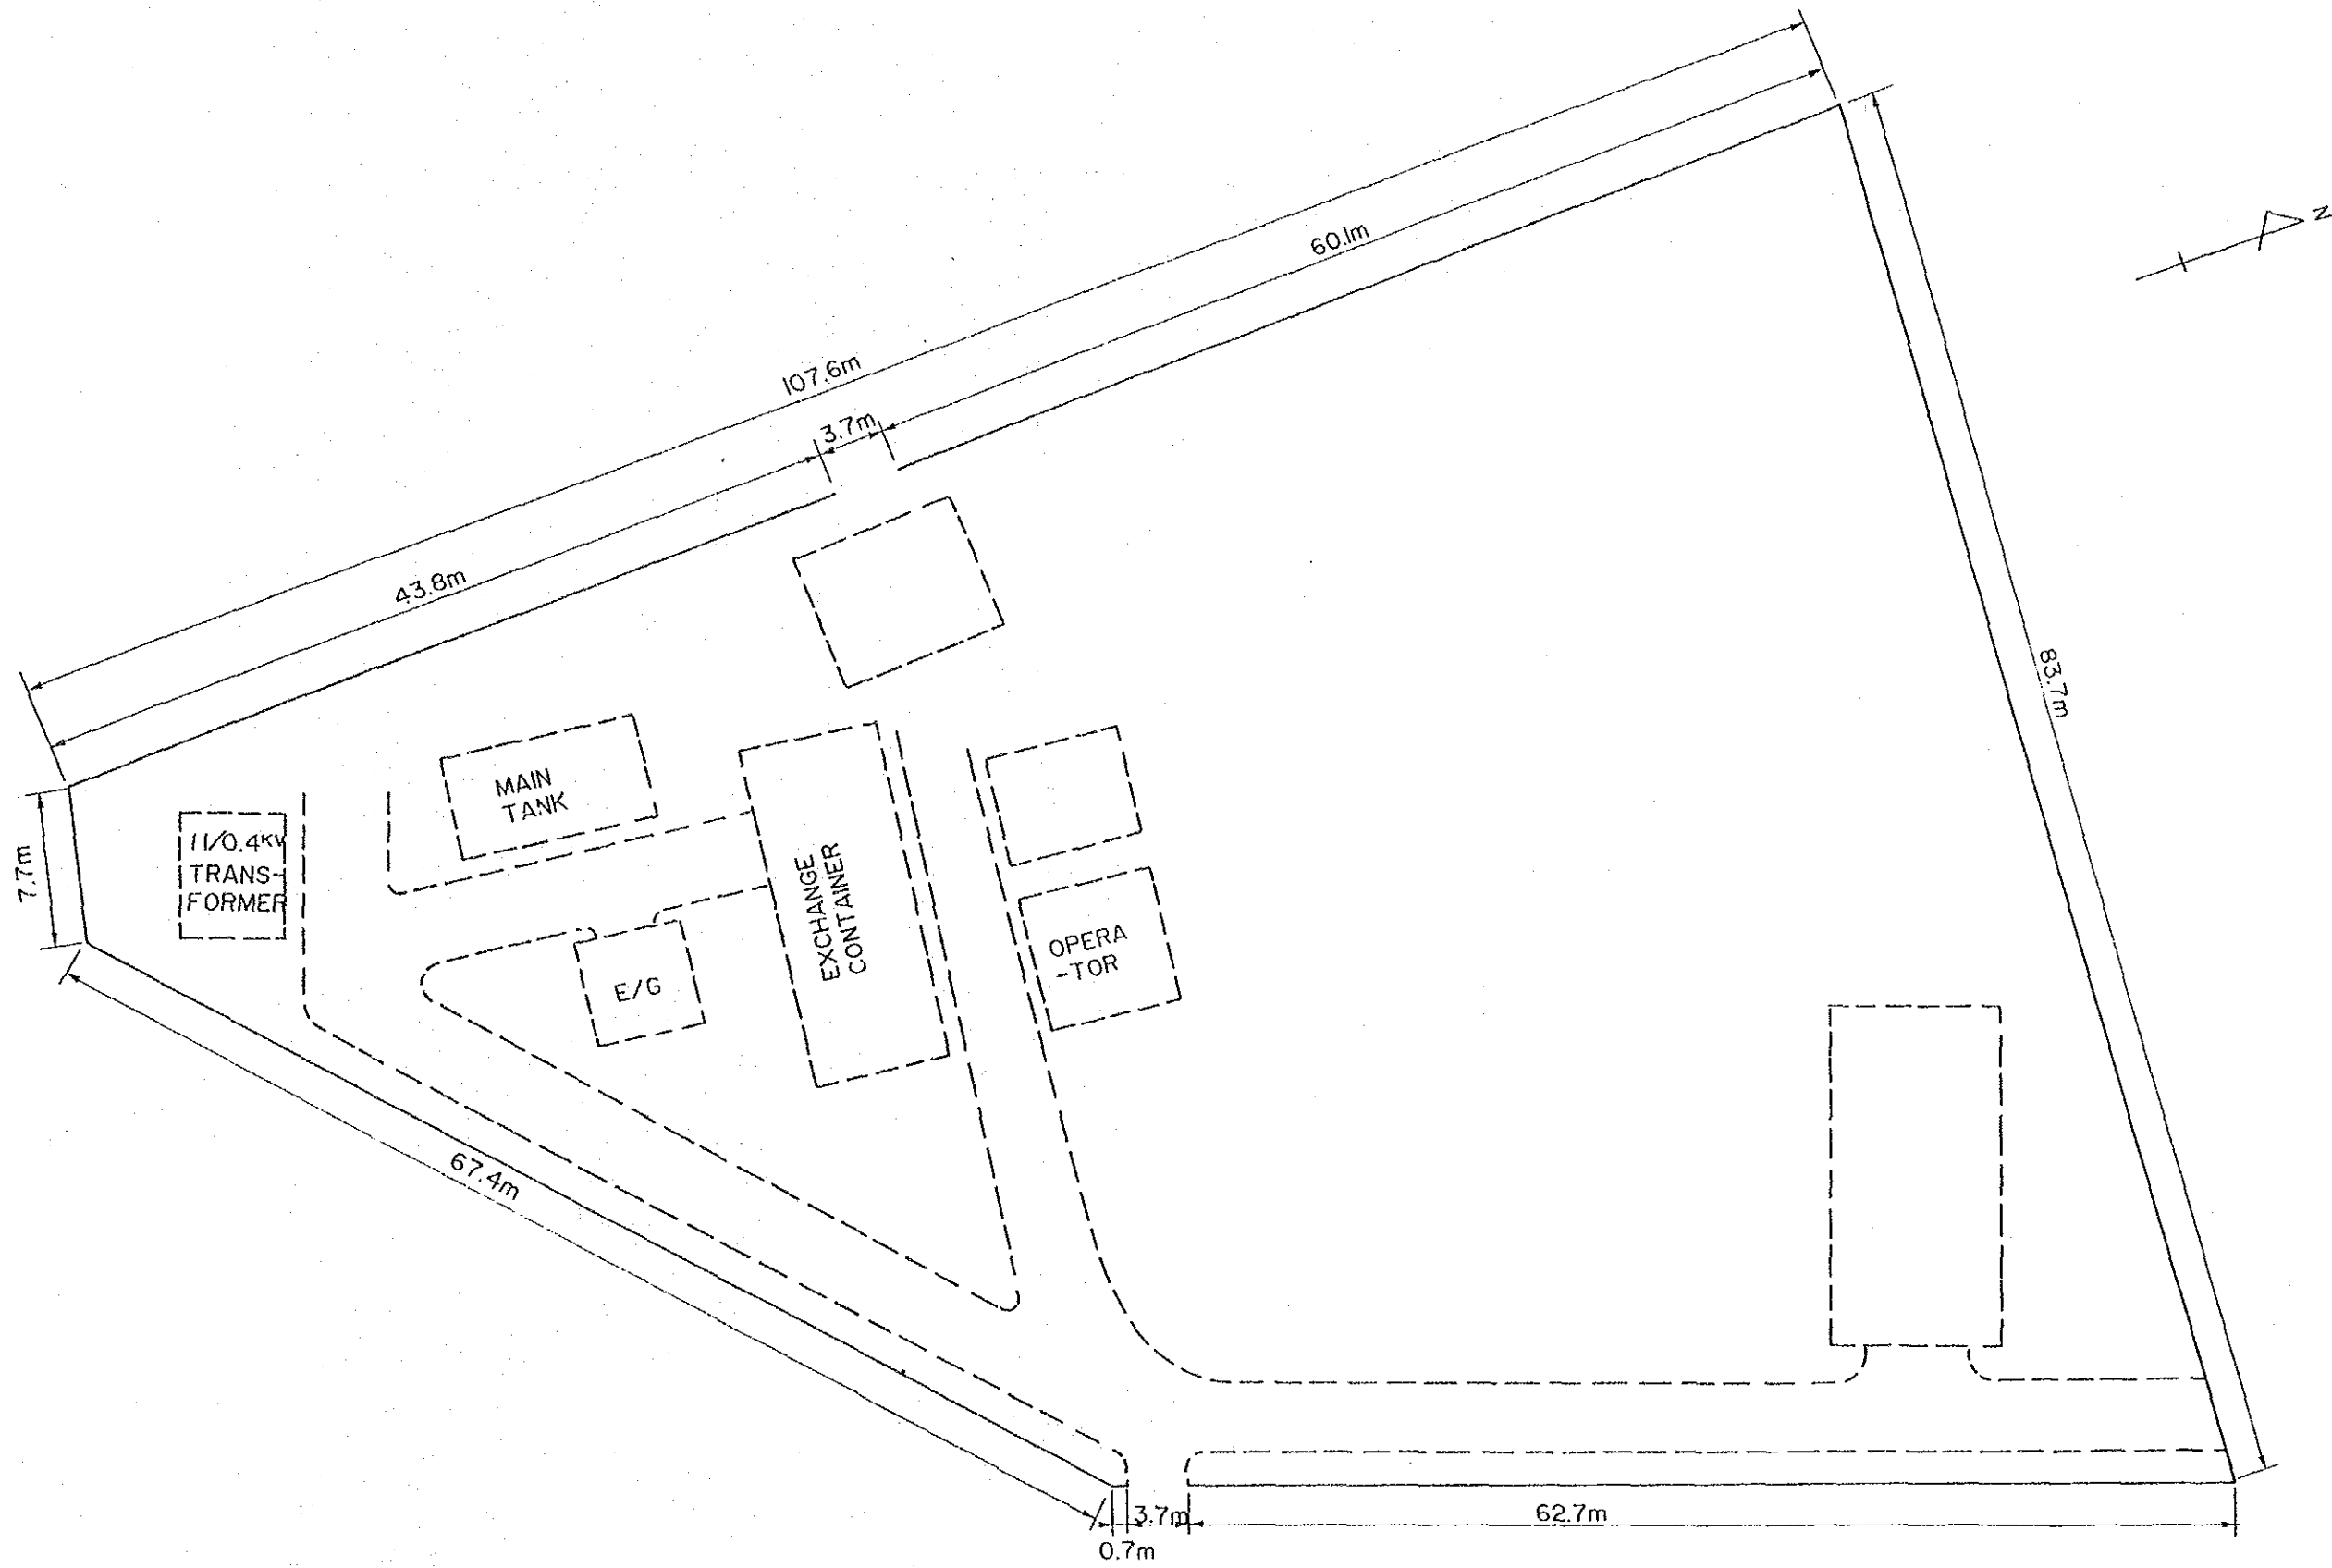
Site Layout Plan at Minbu New Exchange Office
